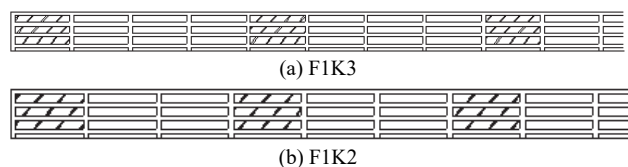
Schematic diagram of the transverse arrangement of exterior barriers a) F1K3; b) F1K2
